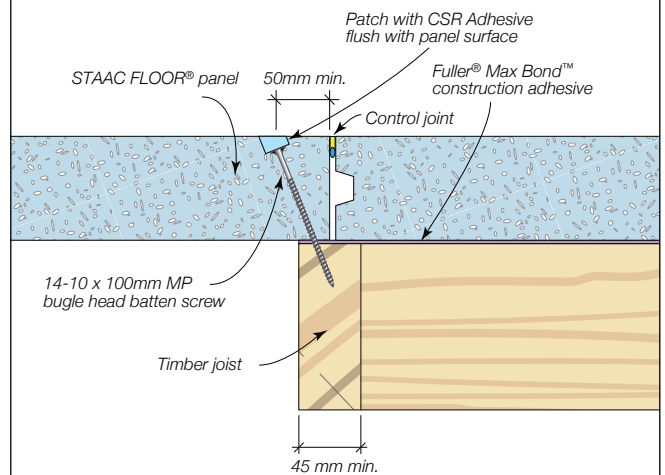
Fixing at End of STAAC FLOOR® Panel to Timber Joists
